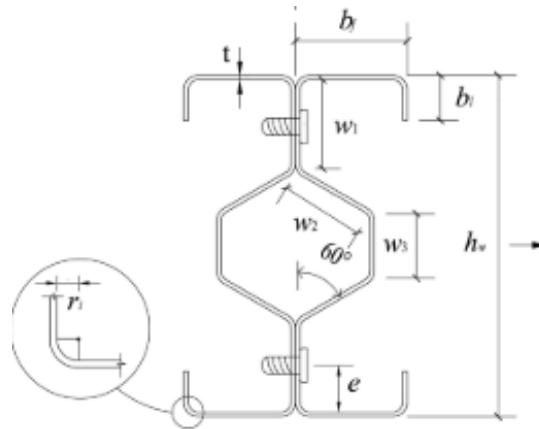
Stiffened back-to-back built-up section named as (OI) [74].
